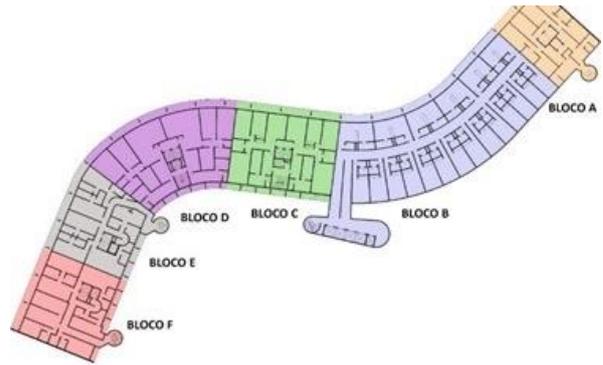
Plan of the typical floor of the COPAN building and its six blocks.
